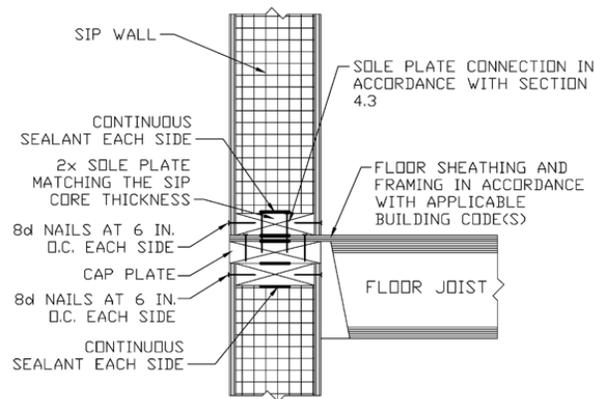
SIP Wall to Wall Balloon Frame Connection (Structural Insulated Panel Association, 2007)
